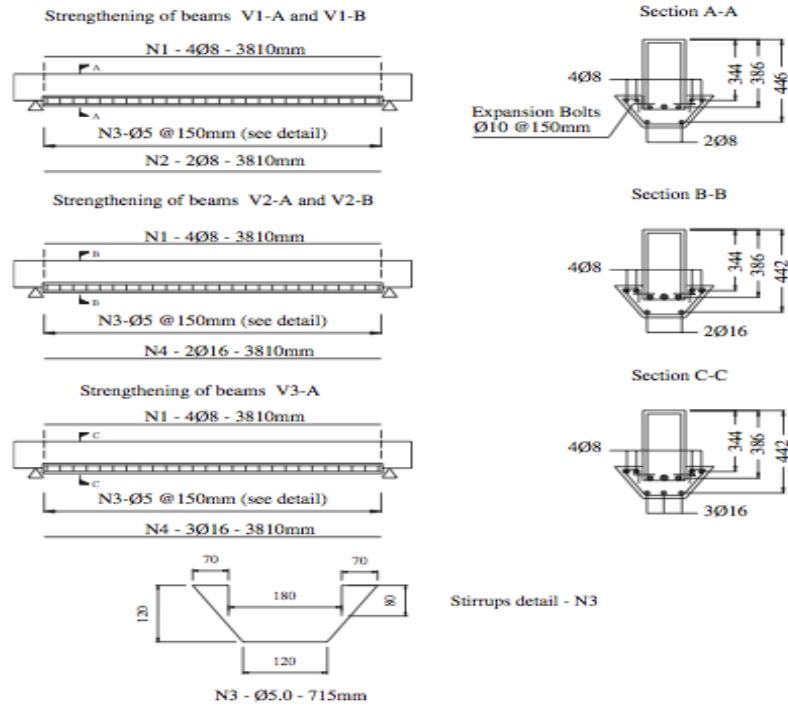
11- Details of strengthening reinforcement in the jackets (Shehata and Shehata 2008).
